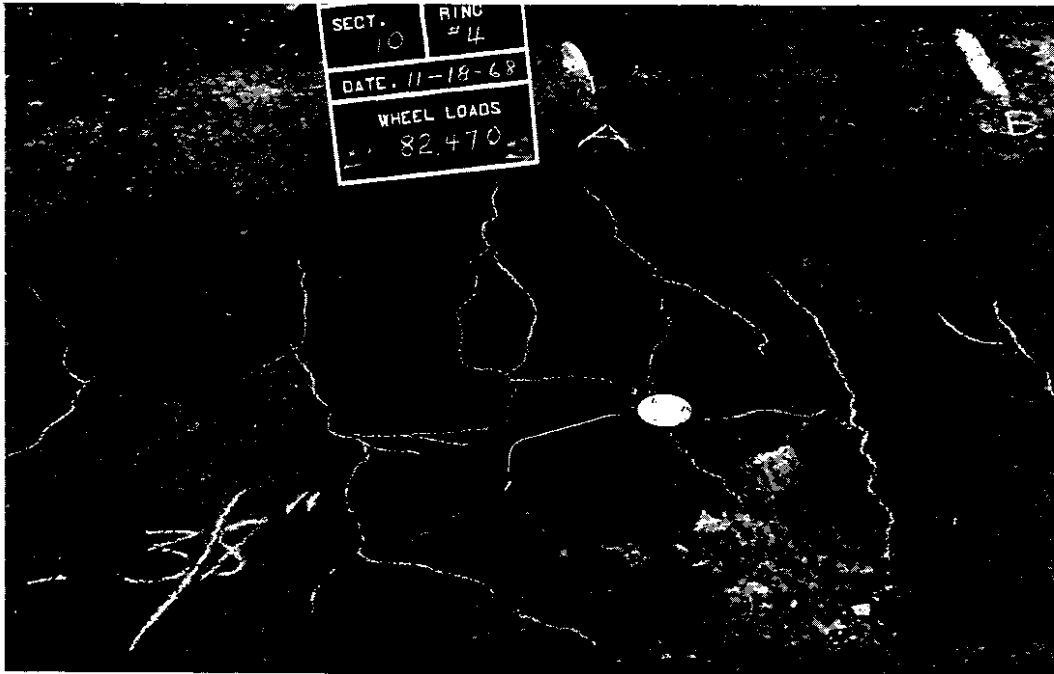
A CLOSE-UP VIEW OF THE CRACKS AROUND LVDT GAGE #7 AFTER 82,470 WHEEL LOADS IN SECTION 10.
